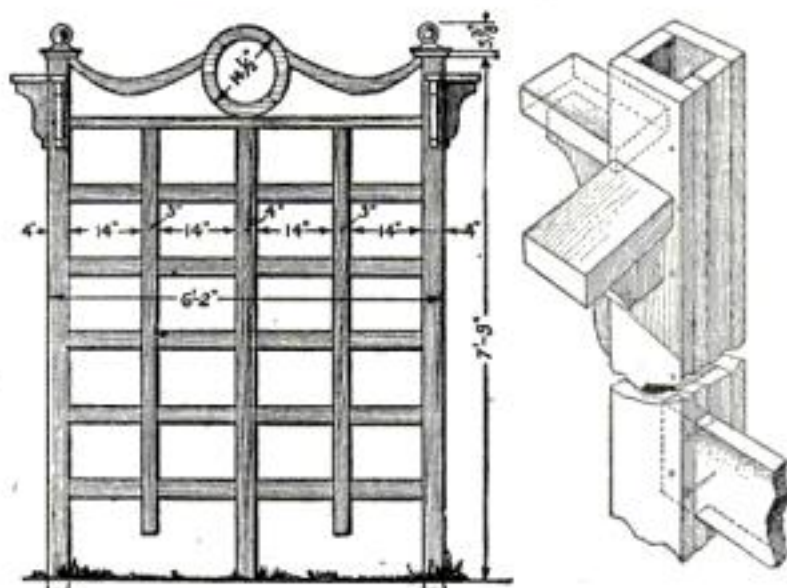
An architectural trellis used against a house wall, and detail, explaining construction, of the posts
